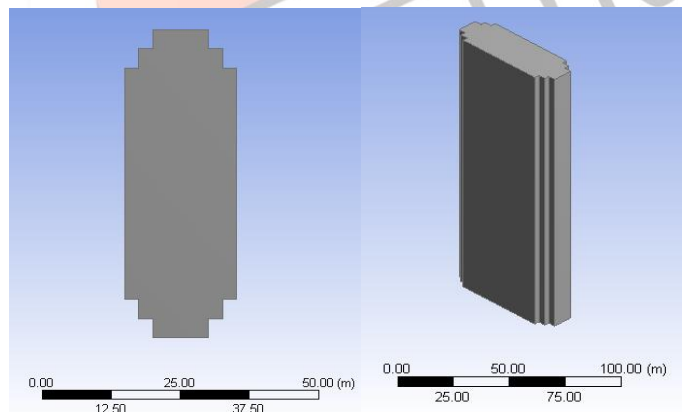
Plan and isometric view of two steps at corner rectangular model
